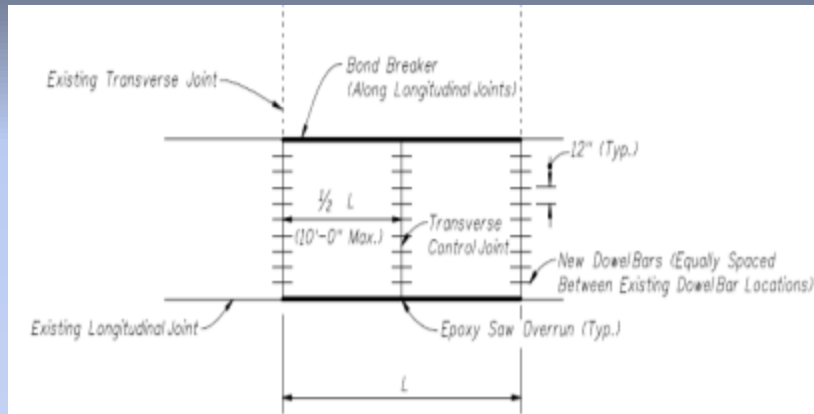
FULL SLAB FULL DEPTH REPLACEMENT
